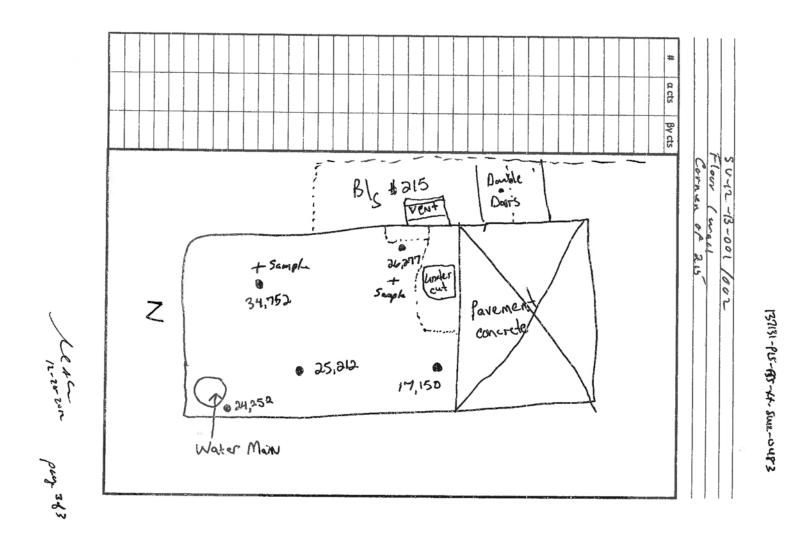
Survey 0483 Valve Pit Area Northwest Corner of Building 215
